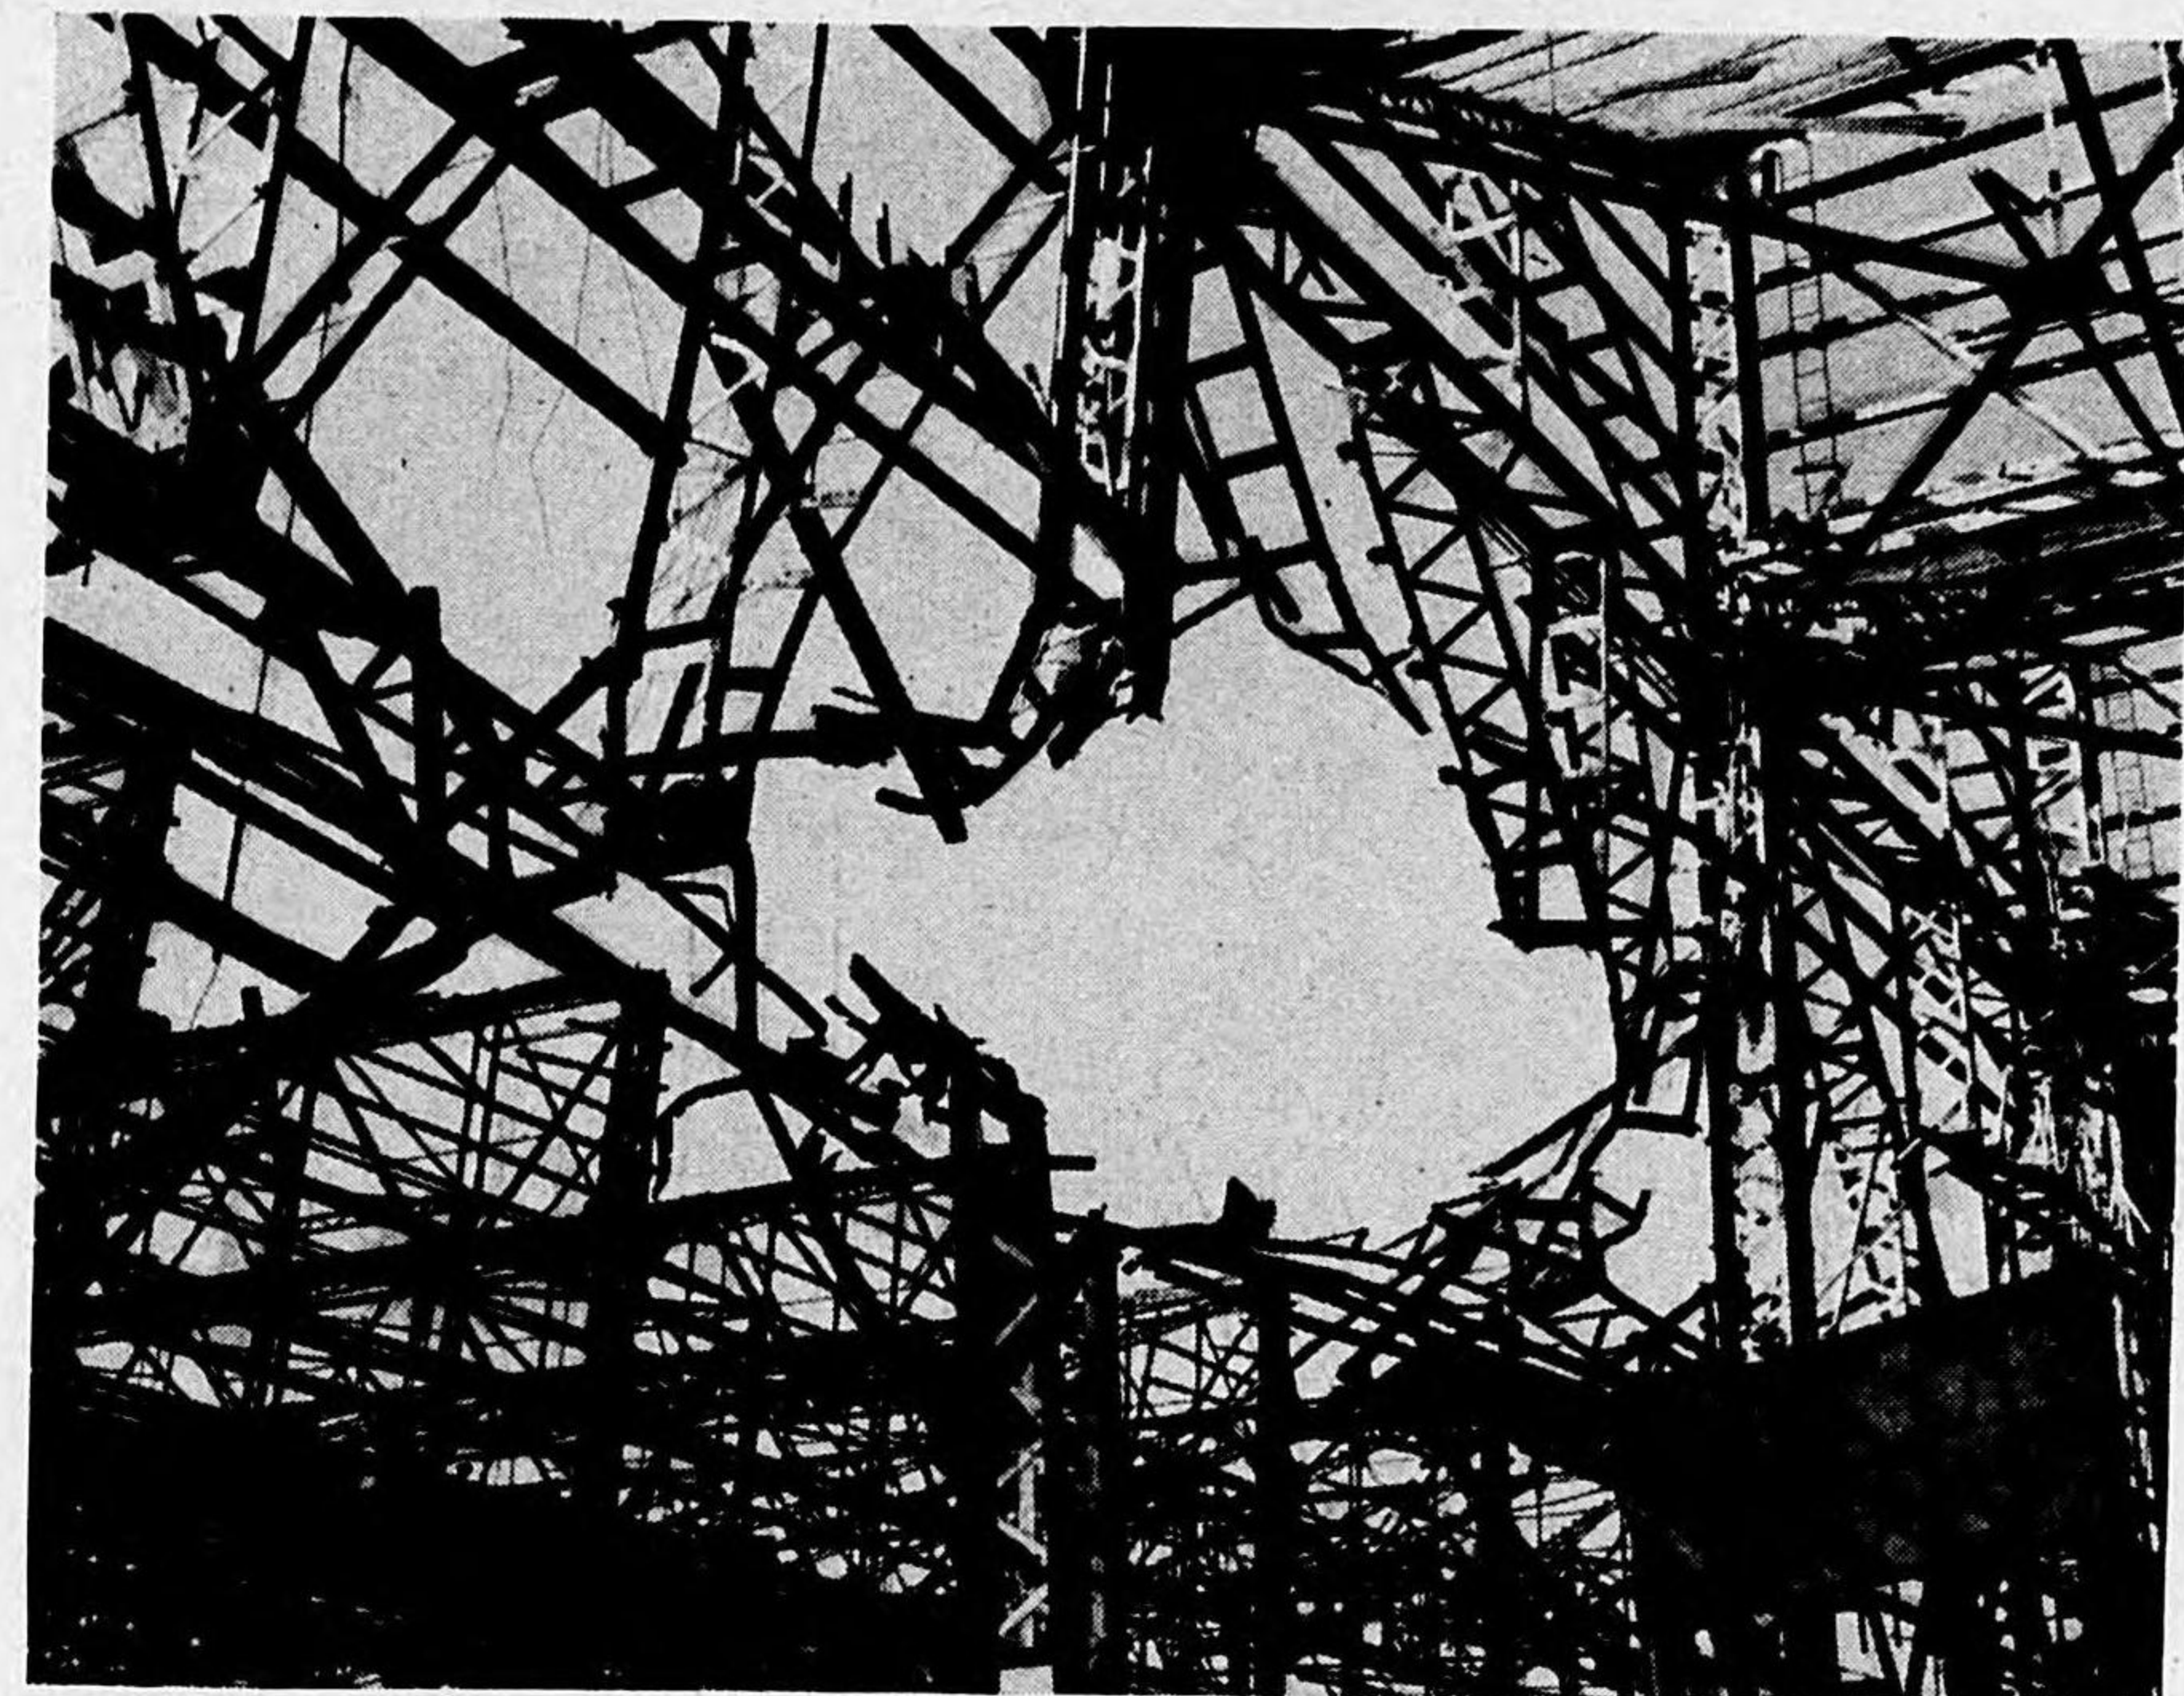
Building 1, Bomb 1, column cut; lower chord of exterior stiffening truss cut.
